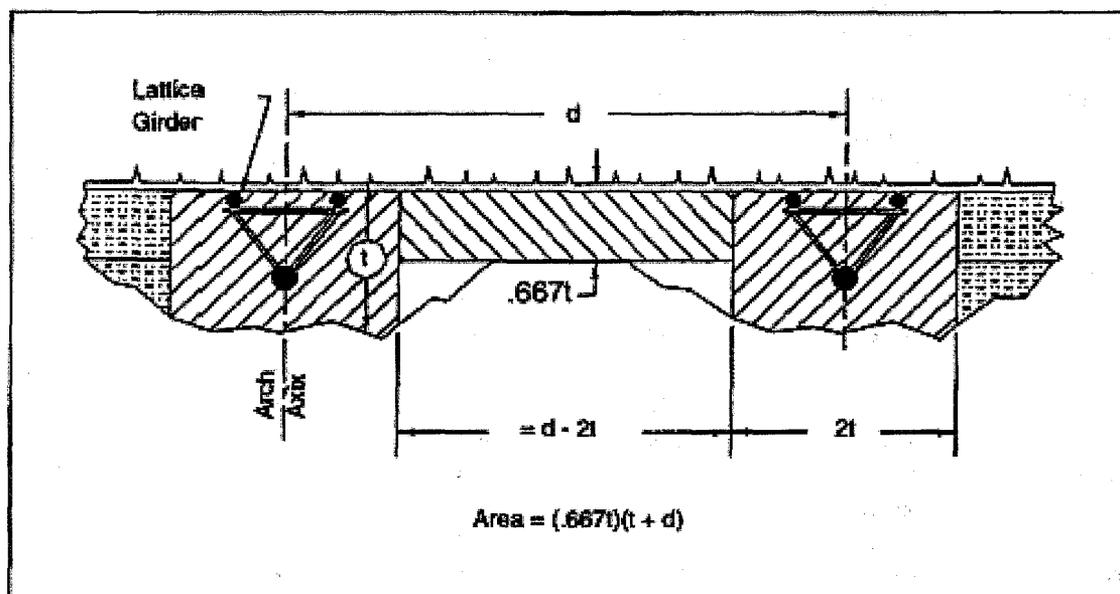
Estimation of Cross Section for Shotcrete-encased lattice Girders
